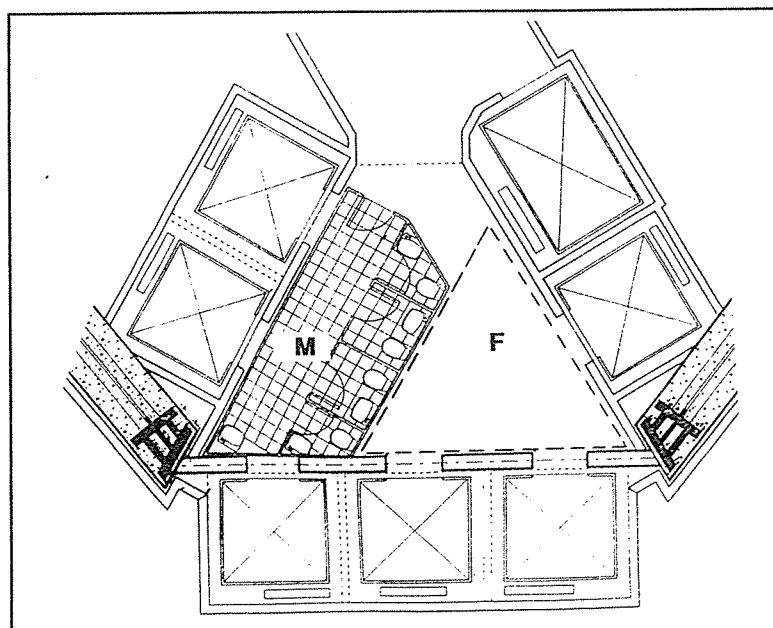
Orientation of Garden Atriums and Cores - Plan
